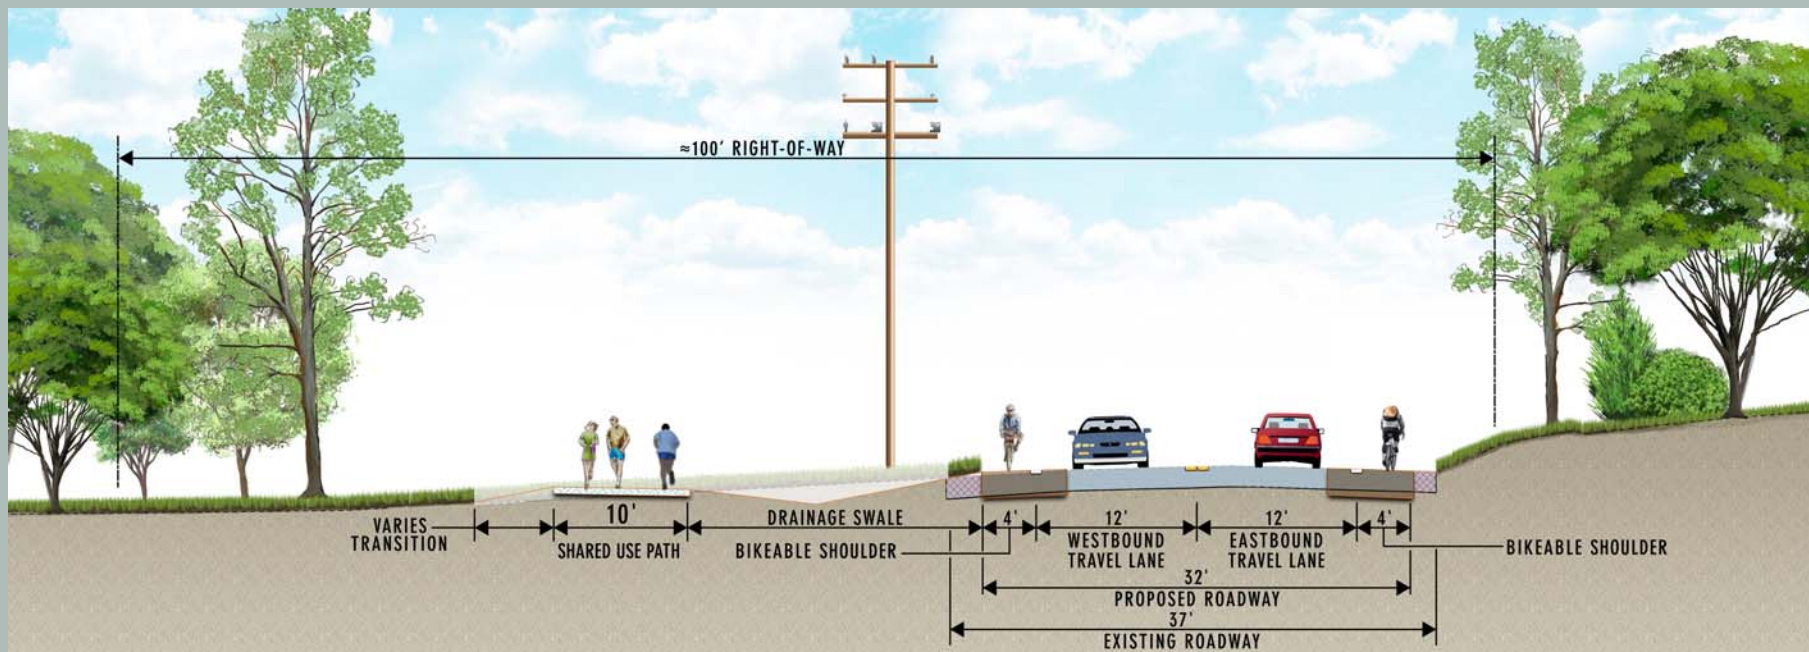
Alternate 2 – Master Plan Typical Section Looking East
